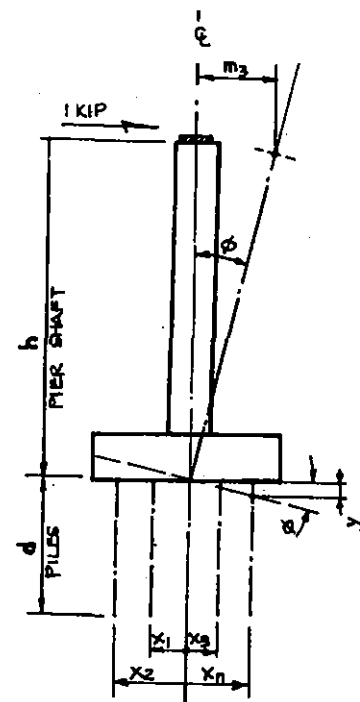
Axial deformation of pile caused by rotation of pier (Example 3B)
